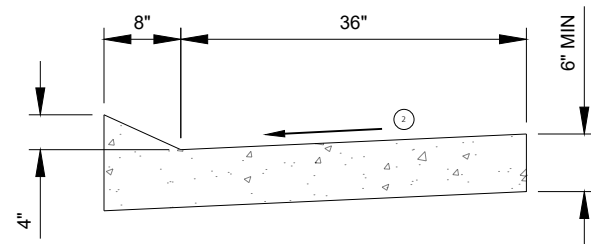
DETAIL OF BUTT JOINT MAINLINE CASCAE MOUNTAIN ROAD & RAMPS
